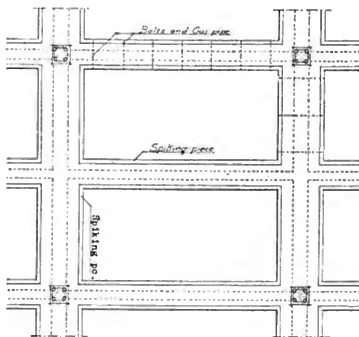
FRAMING PLAN SHOWING PANELS AND ARRANGEMENT OF SPIKING PIECES.
